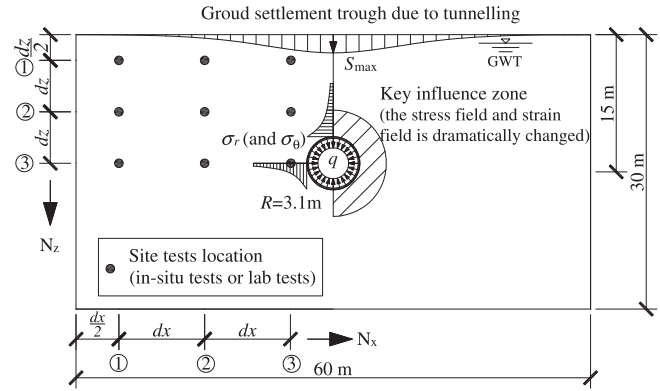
Schematic diagram of tunneling-induced ground settlement, shown with an example site exploration plan.
